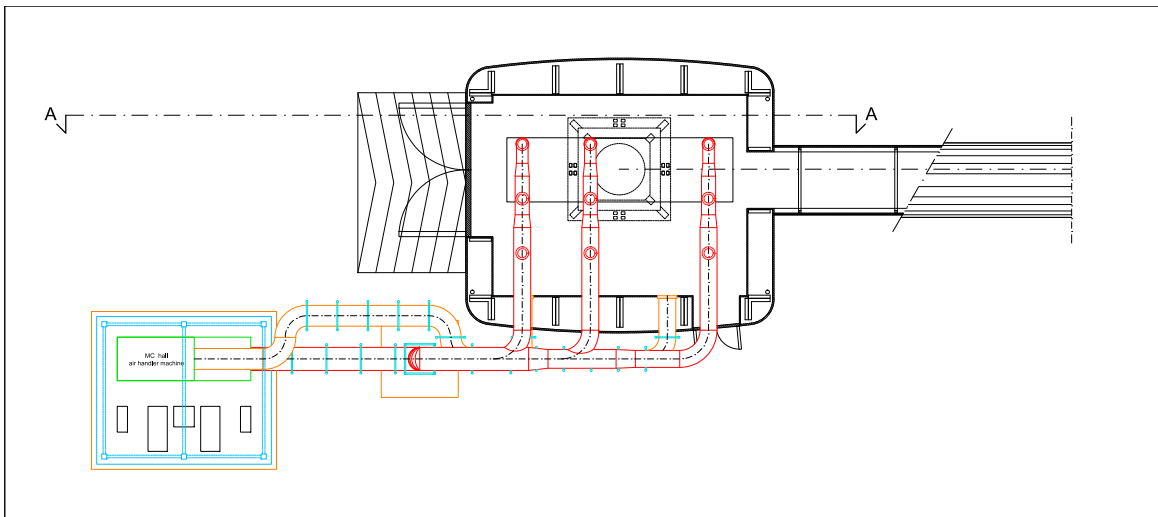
Plan view of the MC building; experimental hall HVAC system.
